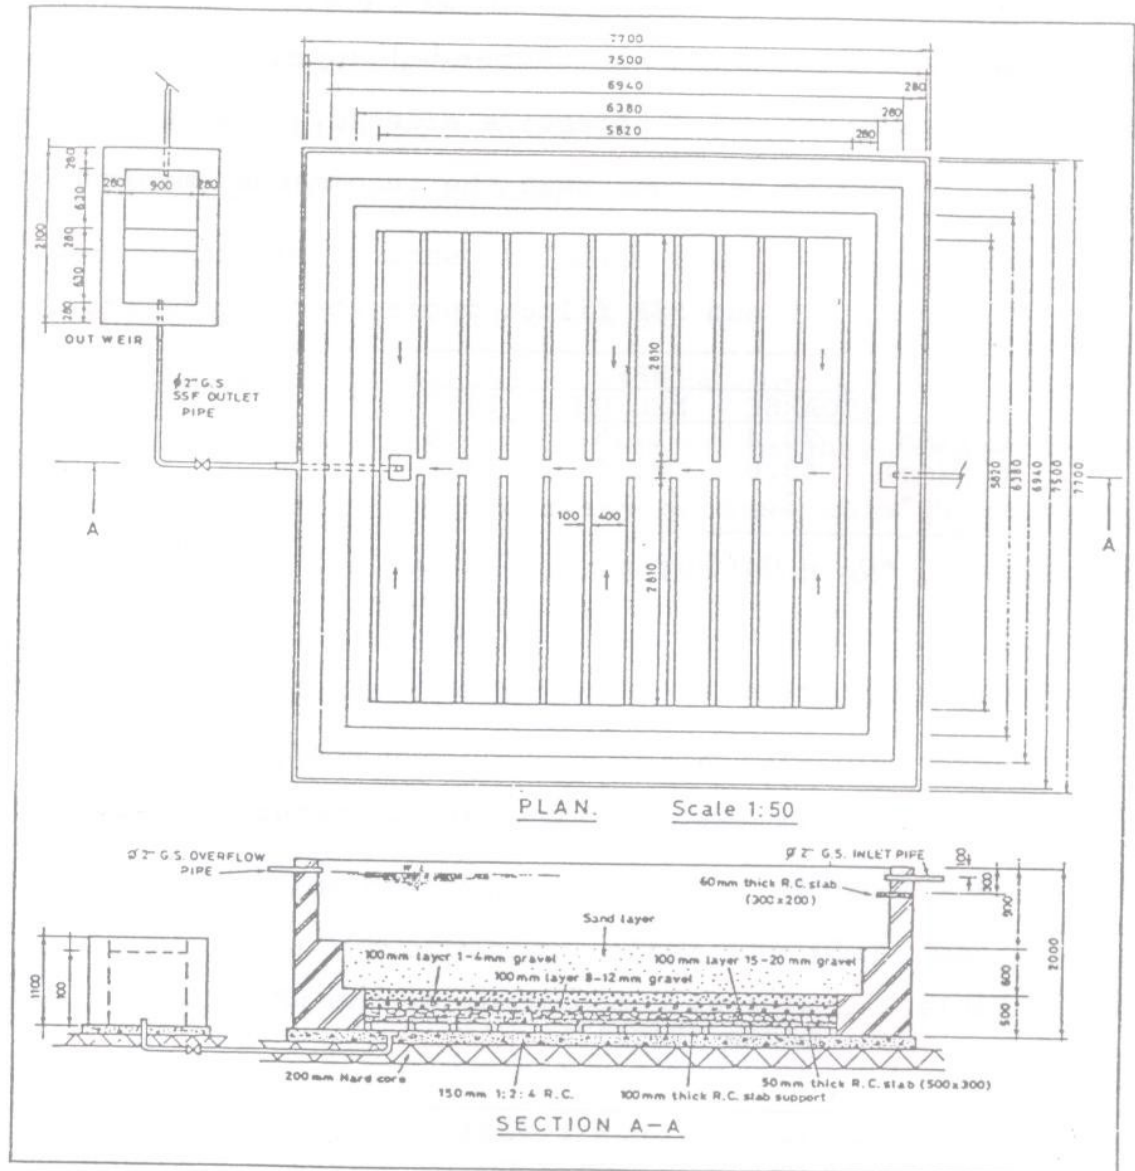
The Layout Plan and Cross Section of The TANESCO Tagamenda plant SSF Unit.
